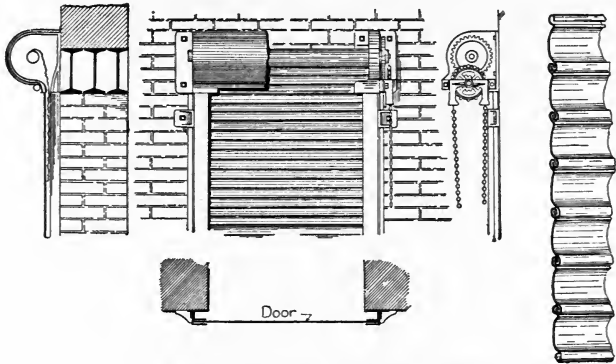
Detail of Rolling Door of Corrugated Steel.
